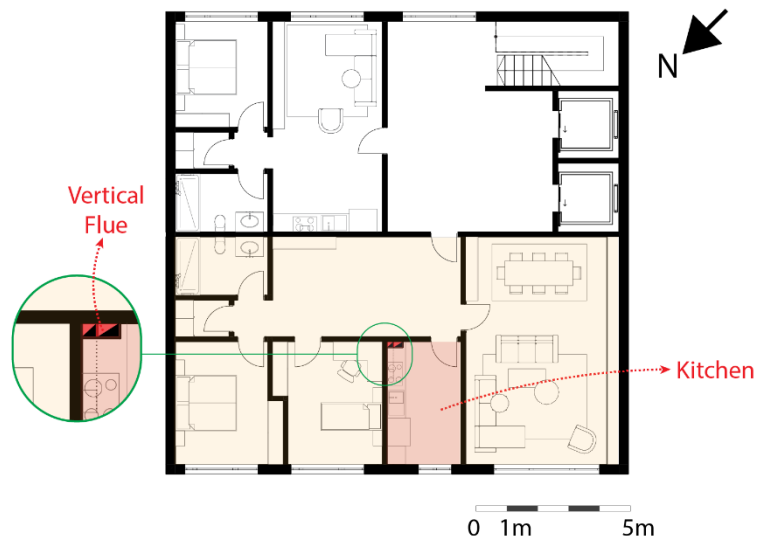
Plan layouts of the apartment building, differentiated by flue type and orientation.
